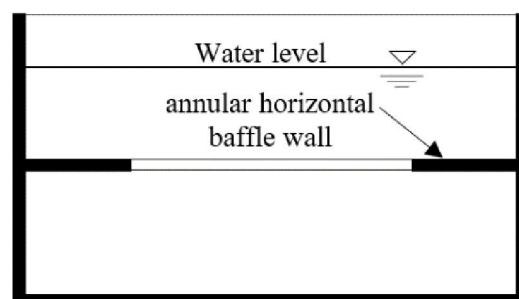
Annular horizontal baffle wall in RCC elevated water tank
